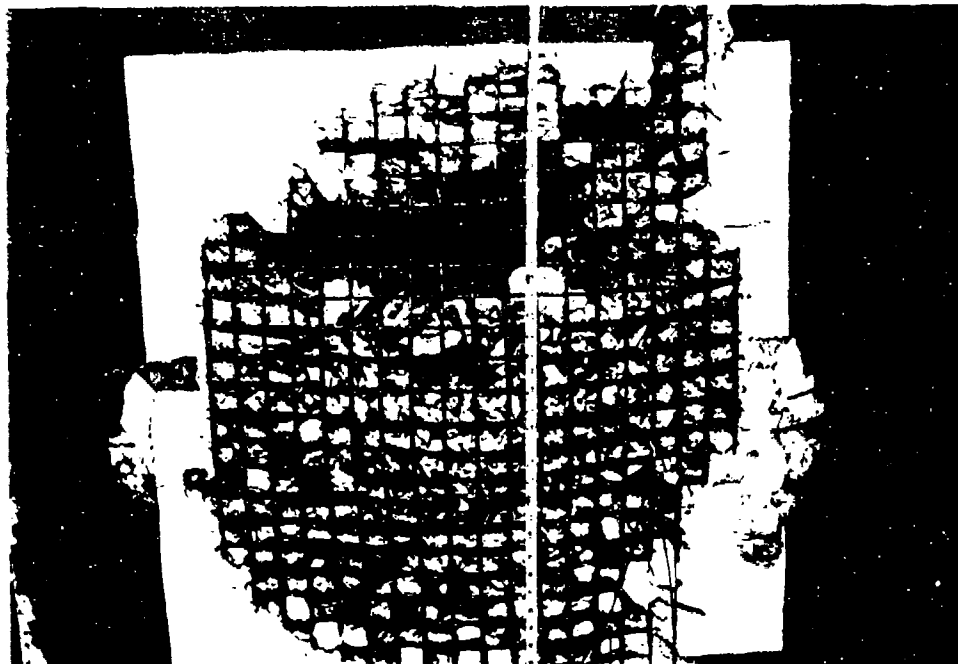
Test 13 Wall Damage (Type B, 2.7-Pound Cased Charge).
